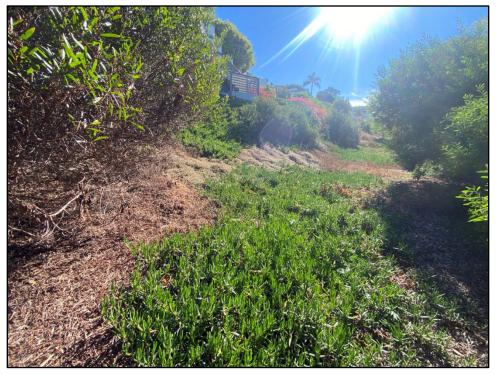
Overview of existing conditions in the southern and western portion of the project site, facing west (photograph taken 11/25/2024).
